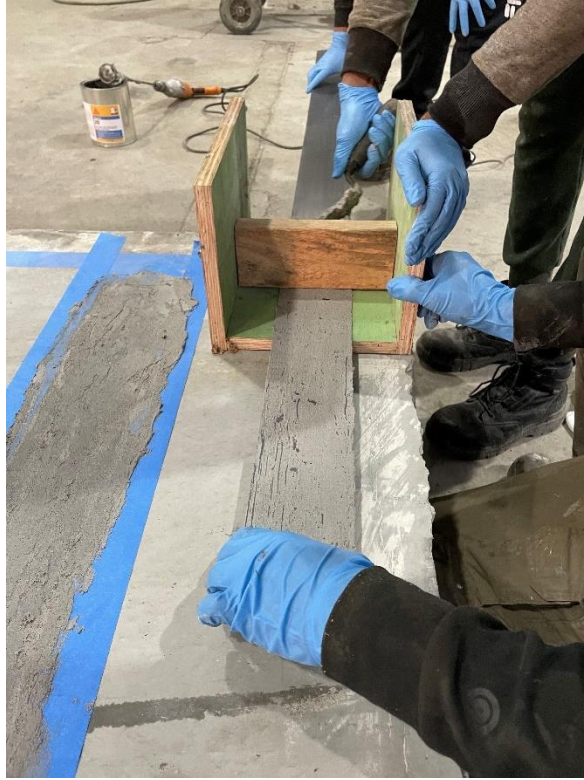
CFRP strip being pulled through epoxy depth control fixture.
